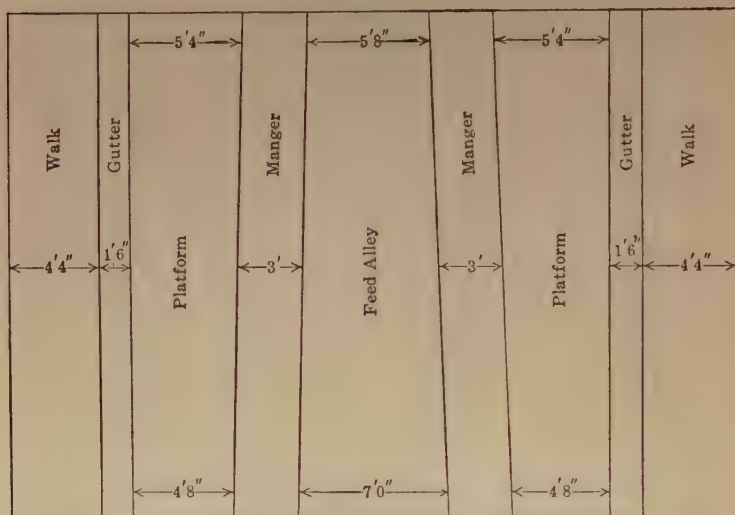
DIAGRAMMATIC FLOOR PLAN OF BARN
